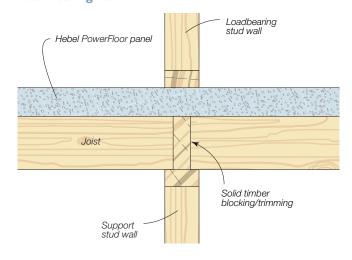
Platform Flooring with Internal Loadbearing Wall
